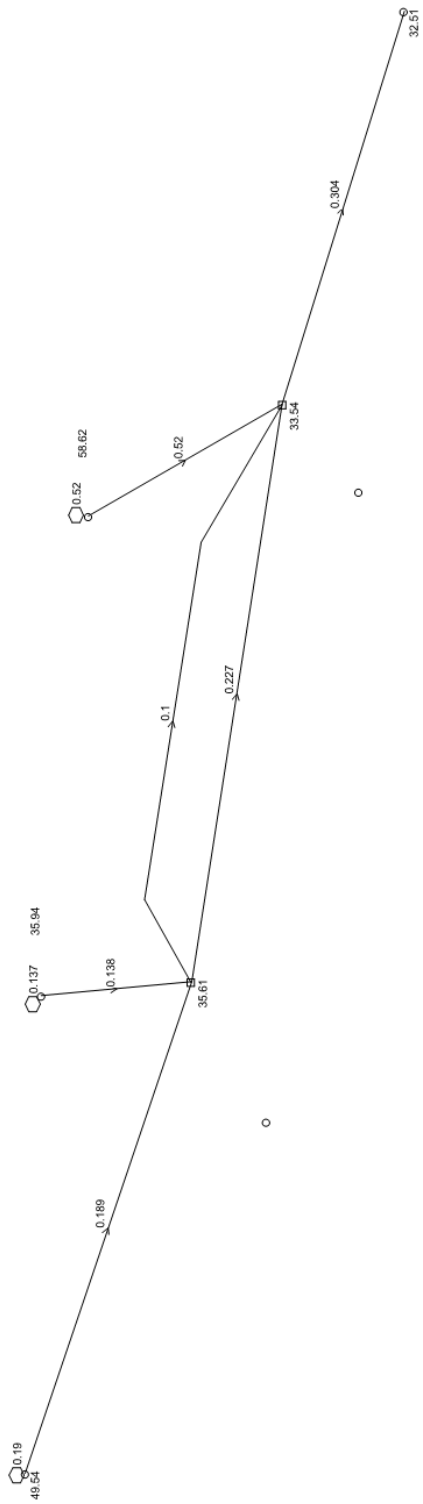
DRAINS Plan Layout. Source: DRAINS
